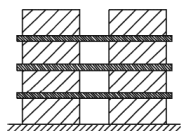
Composite structural systems. Type 3 – composite or concrete walls coupled by steel or composite beams.
